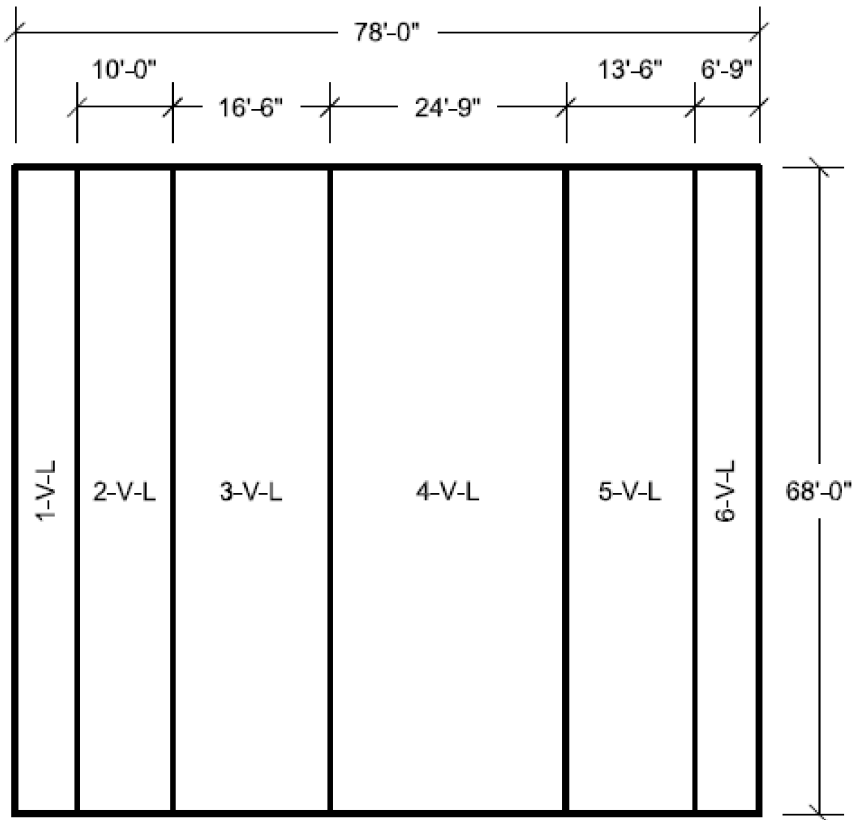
H.6-59 Pump House East Wall Looking West Vertical Reinforcement Zones Far Side Face
